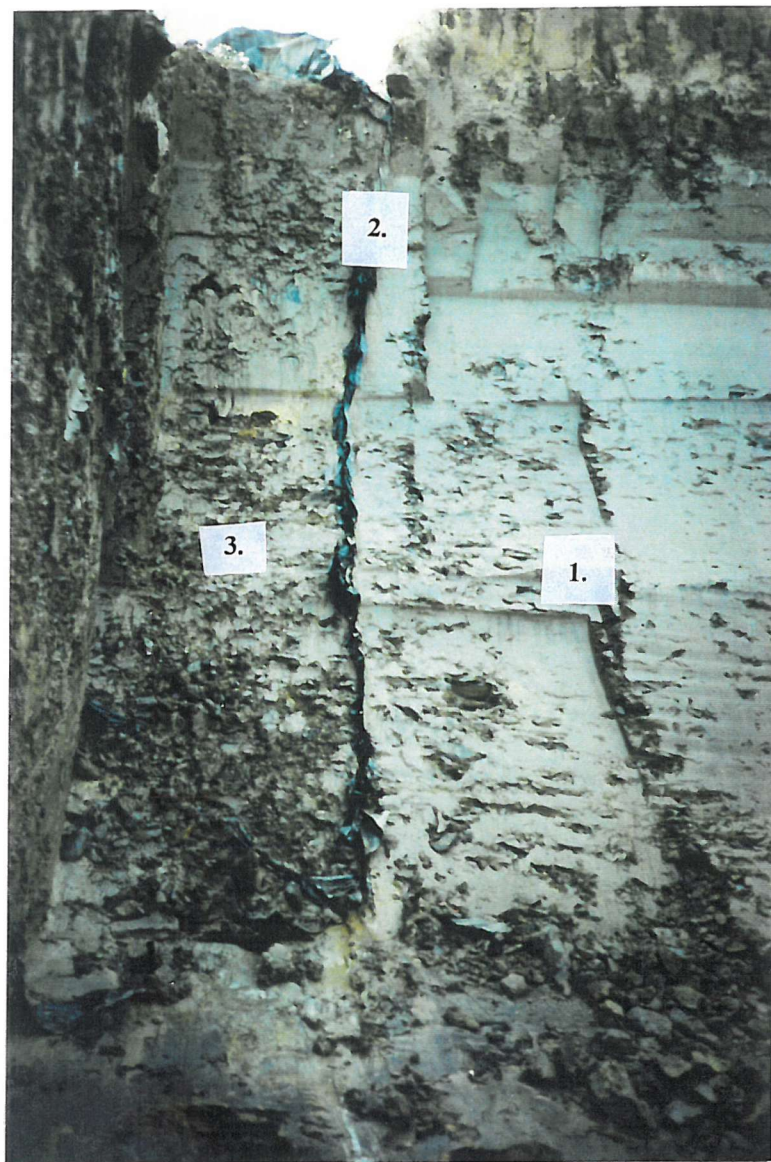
Southern side shear break exposed during the post-failure dig out.
